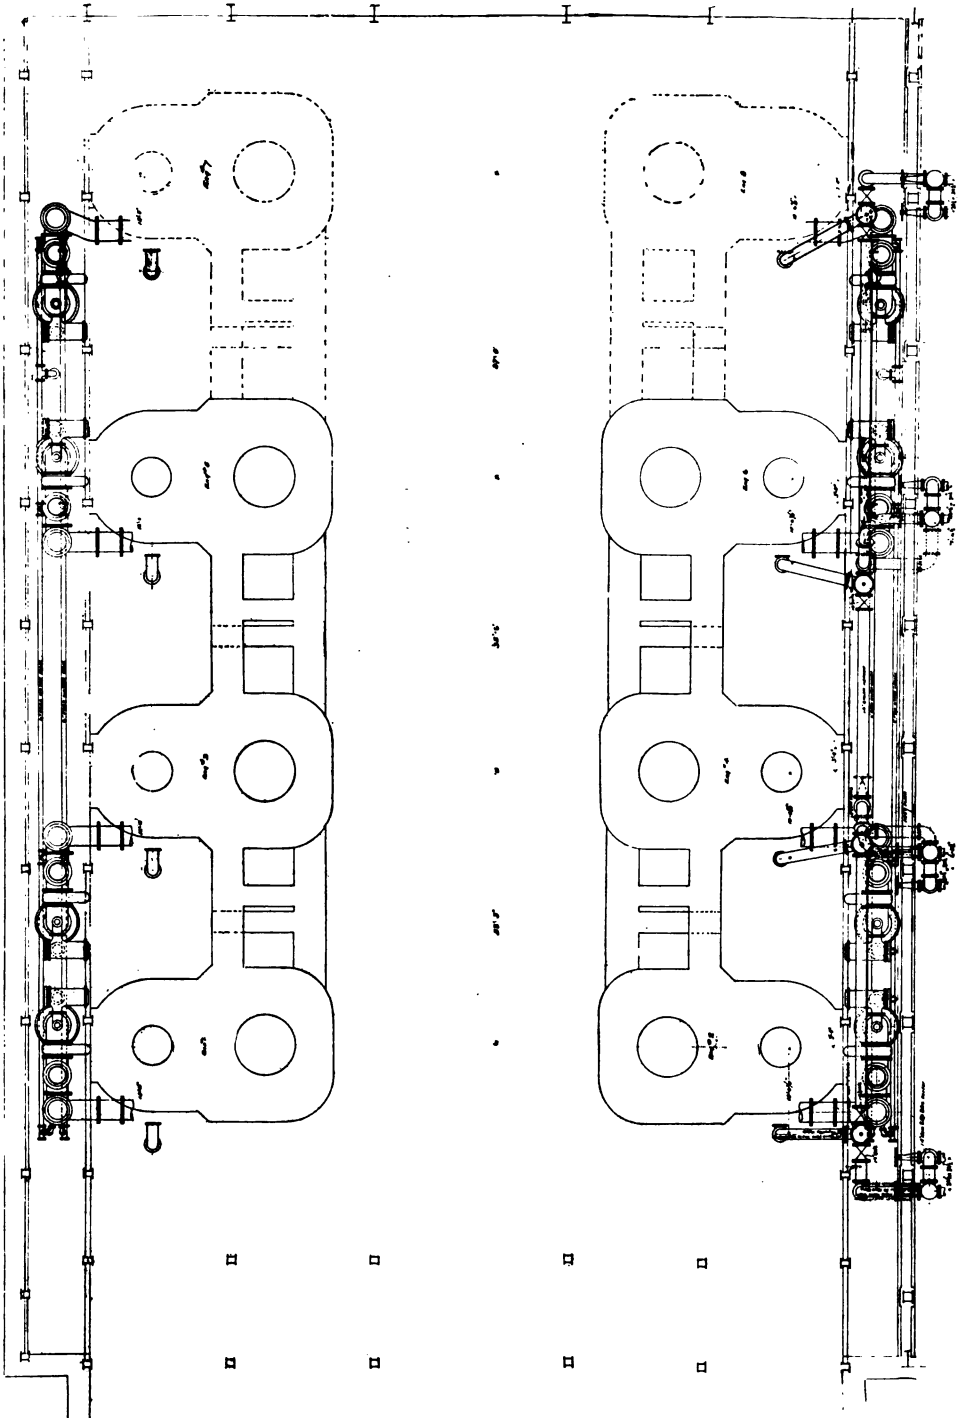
Plan of Piping on First Floor, Central Power Station, B. R. T.
